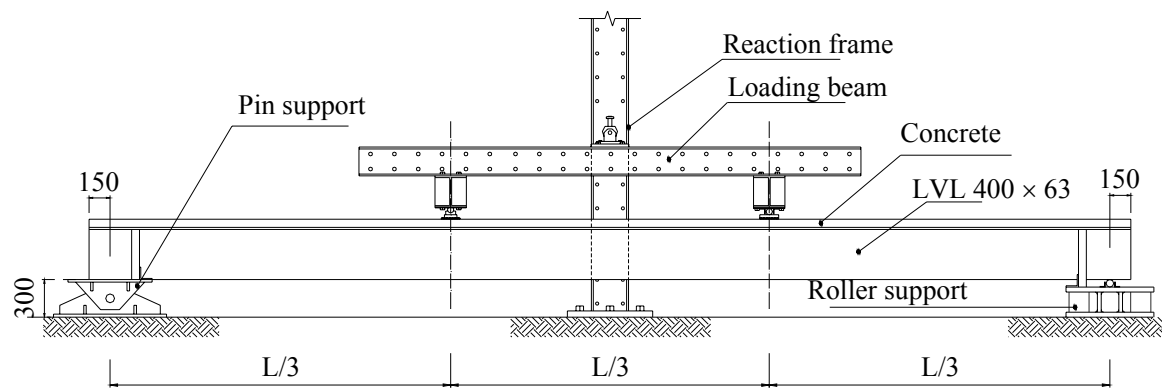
Typical four point bending test set-up (dimensions in mm)
